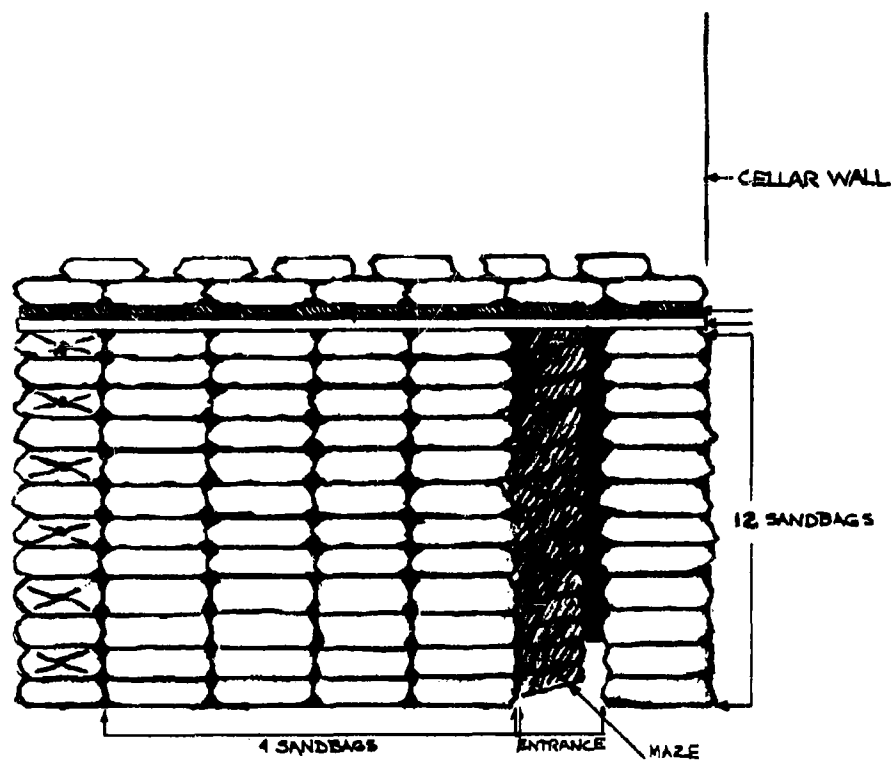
Sandbag Shelter Showing Method of Constructing the Roof
